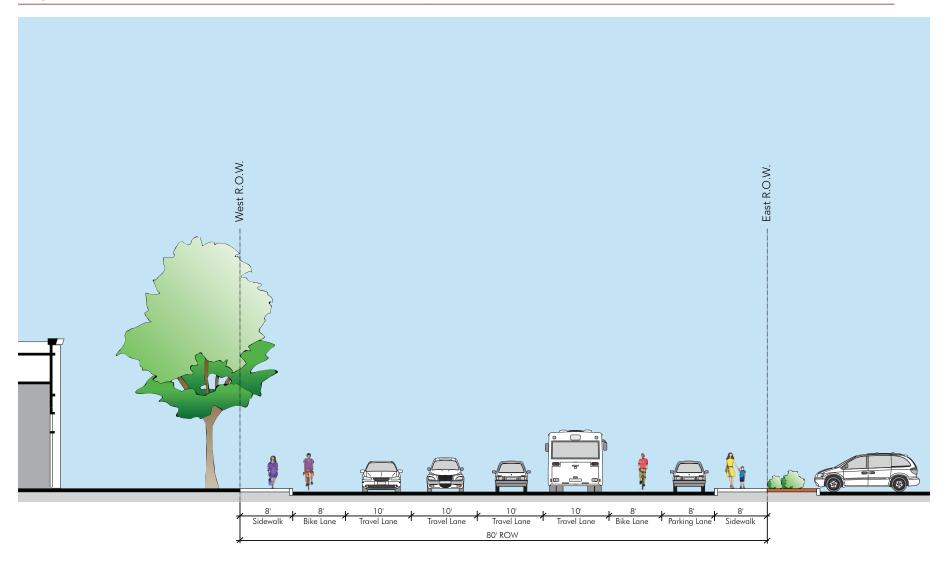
A: 2016 Highland Avenue Existing Street Section (Northbound View)
